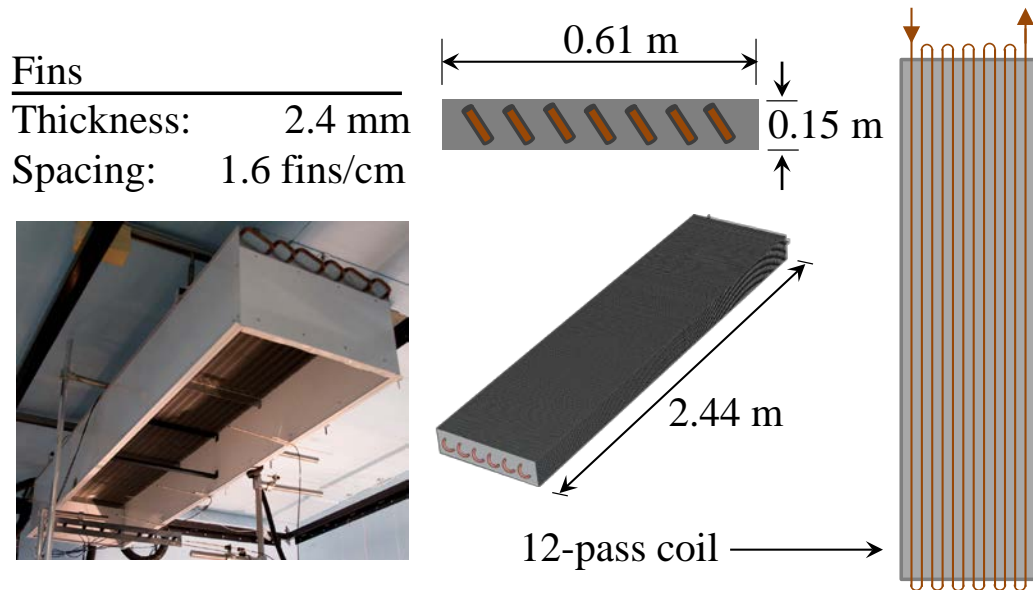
Passive Chilled Beam (PCB) geometry and dimensions.
